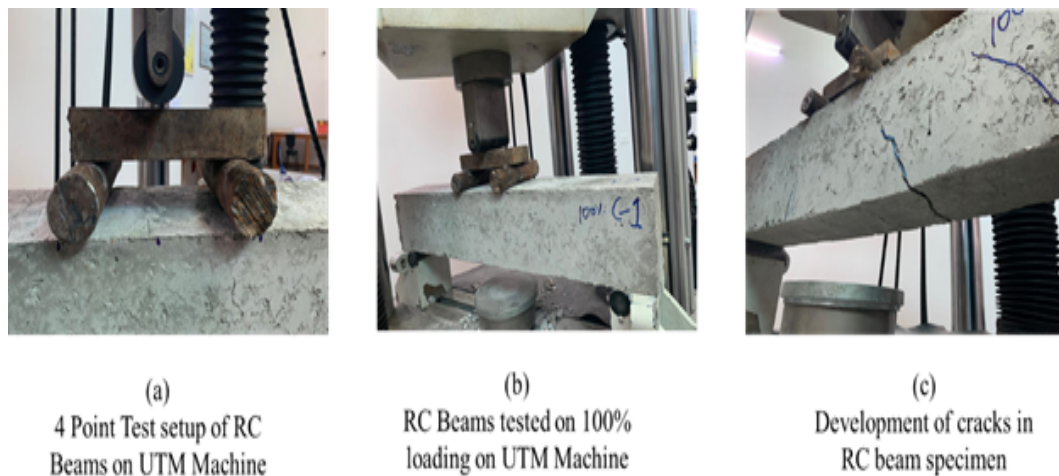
RC Beam Specimen tested on UTM with 100% Loading
